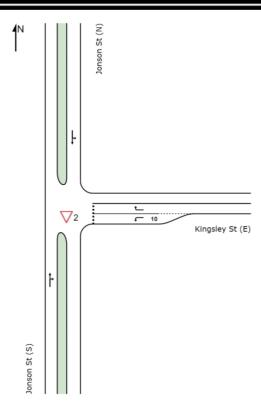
Jonson Street / Kingsley Street SIDRA Intersection Layout
